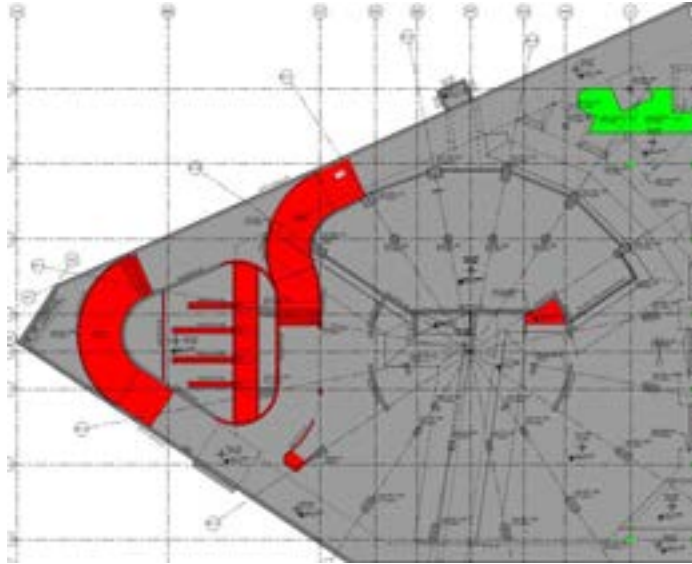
Basement Slab level 2 opening works at Tower highlighted in red
